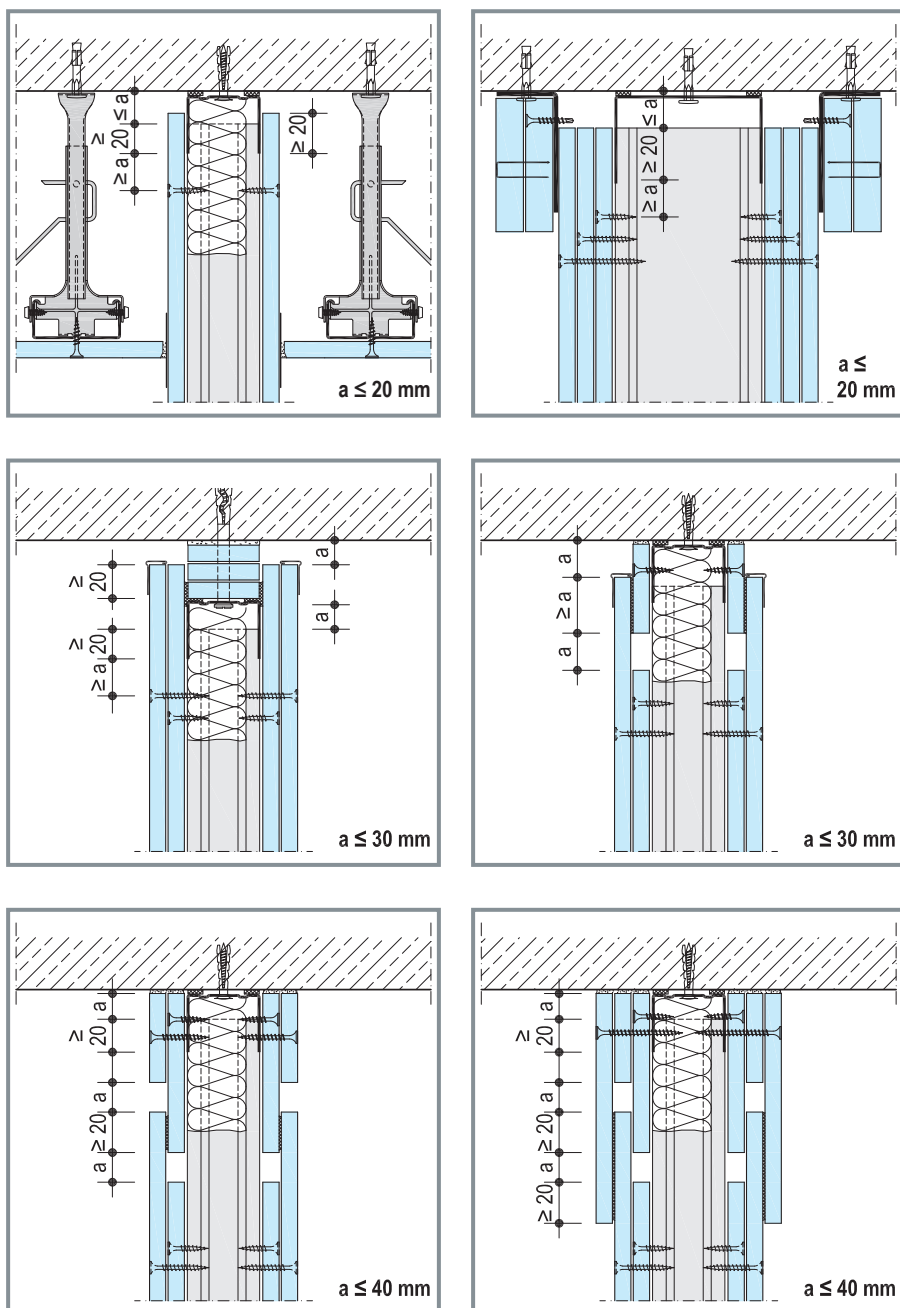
Sliding ceiling connections, room for movement 10 - 40 mm
